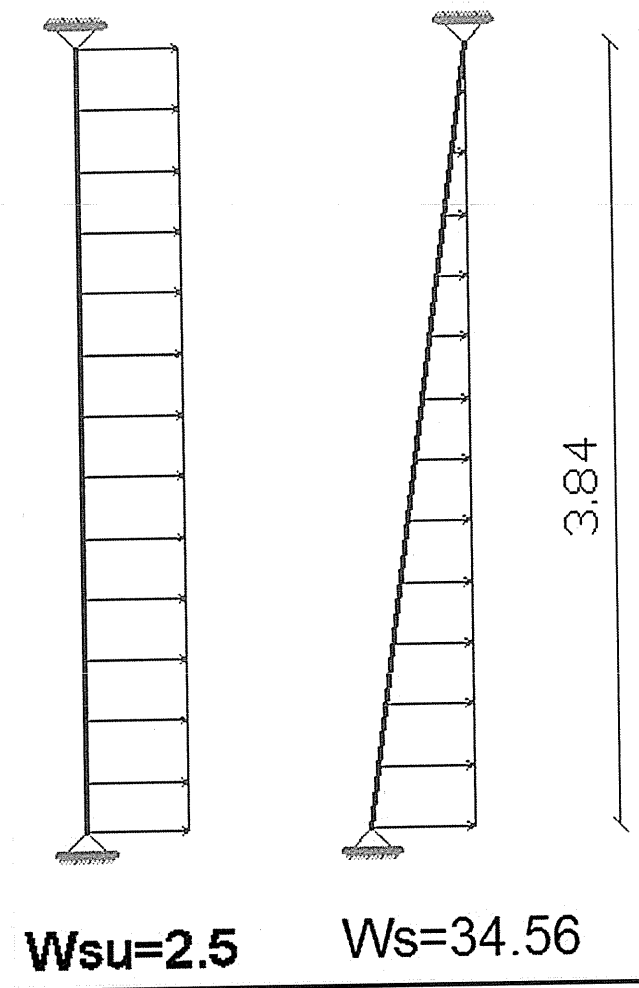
Geometry Of Basement Wall ( BW1 )
